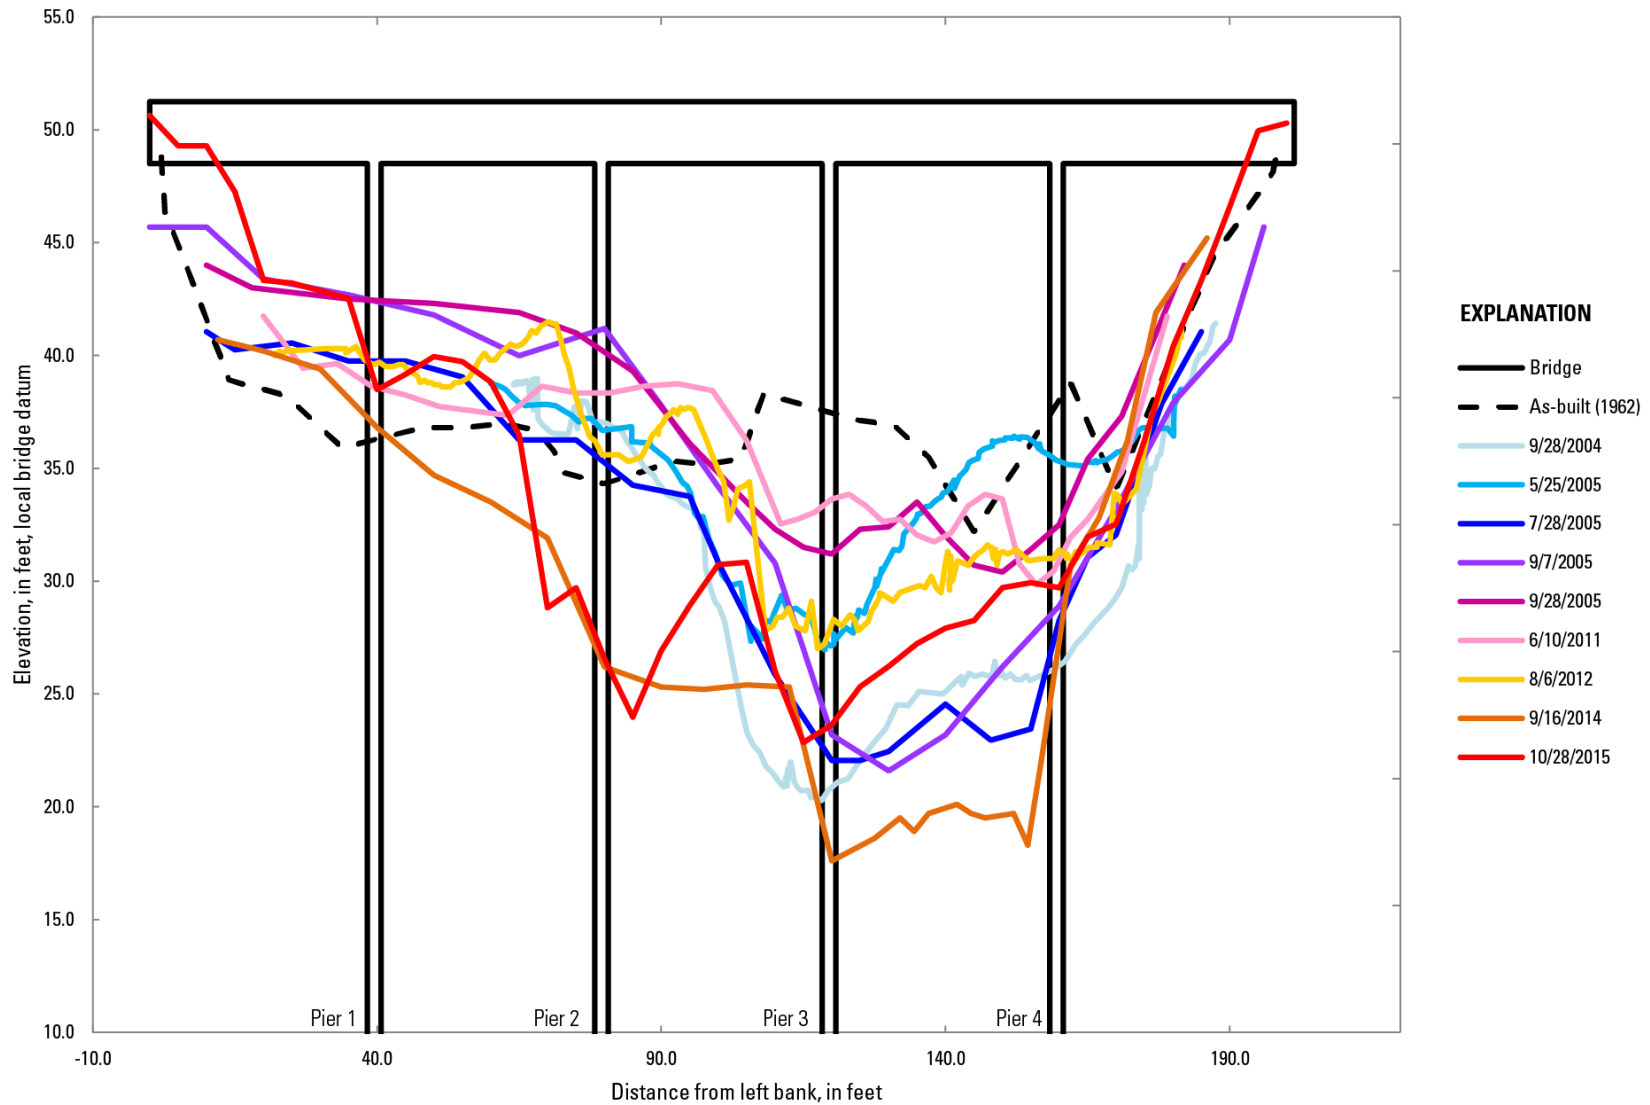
Cross sections showing downstream soundings at bridge 230, Sheridan River, Alaska, 2004–15.
